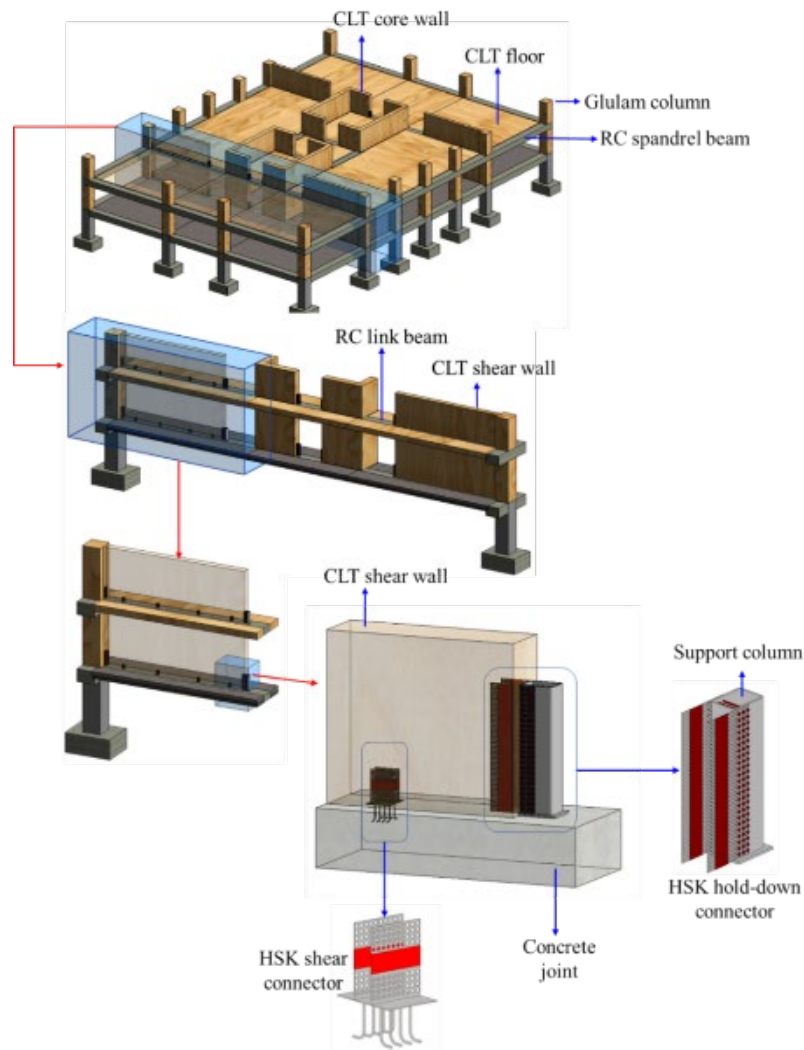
Structural system of the studied tall mass timber building (HSK = Holz-Stahl-Komposit) (Bezabeh et al., 2020b).
